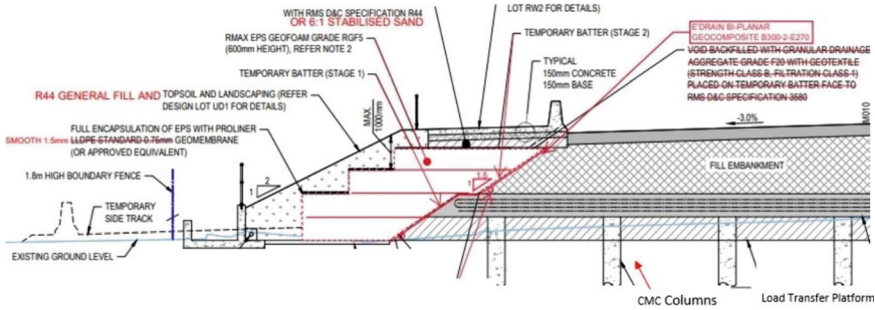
Cross-section detail for the lightweight fill at Batemans Bay
